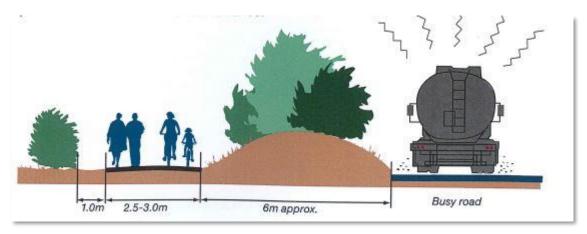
Extract from Sustrans Design and Construction Guidance of 'Traffic Free' Sections
